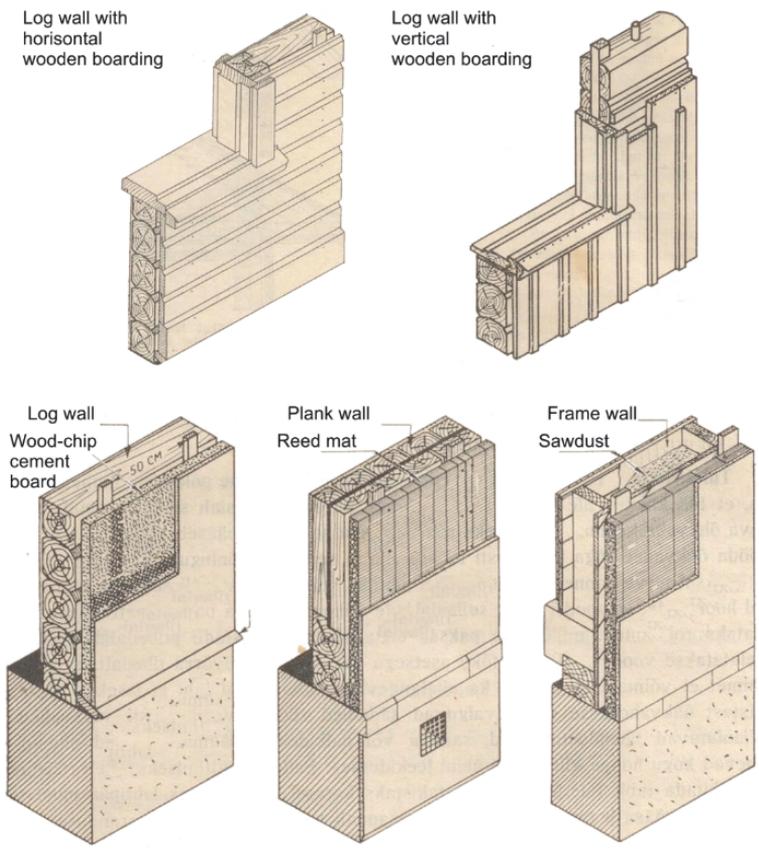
Typical external walls of wooden apartment buildings (based on Veski 1943).
